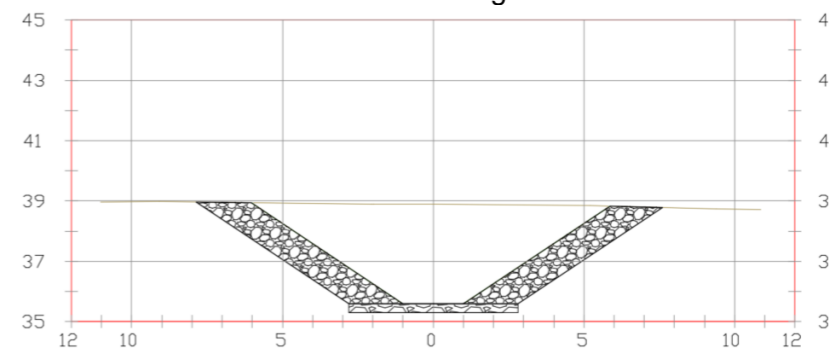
Culver CU0381. Typical section of open temporary ditch to connect with land melioration
